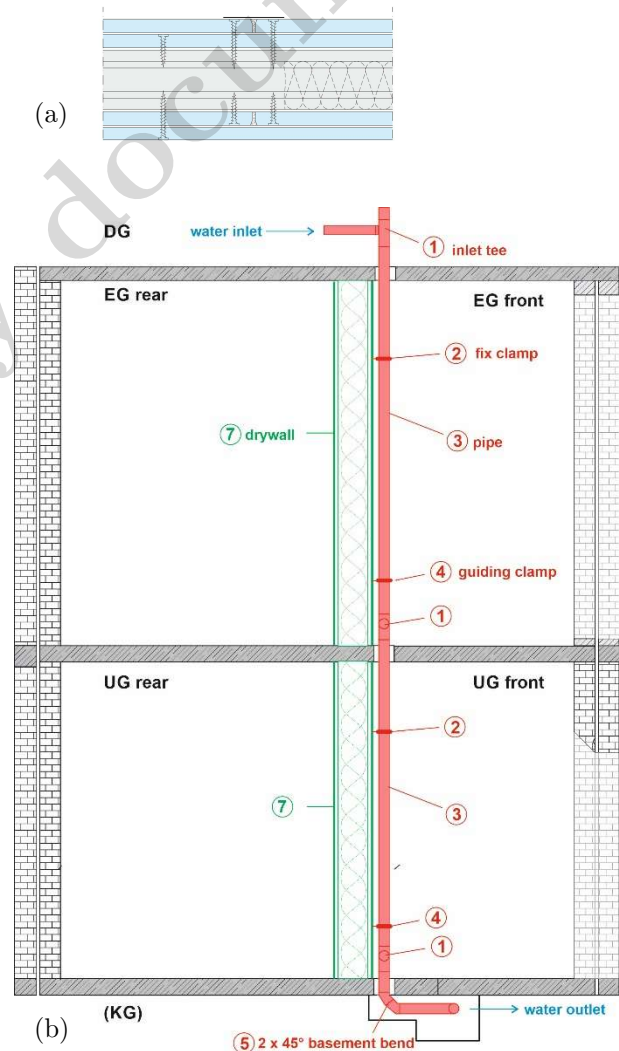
Sketch of the lightweight construction: (a) wall section view, ©Knauf [3]; (b) laboratory arrangement in P10, ©Fraunhofer IBP.
